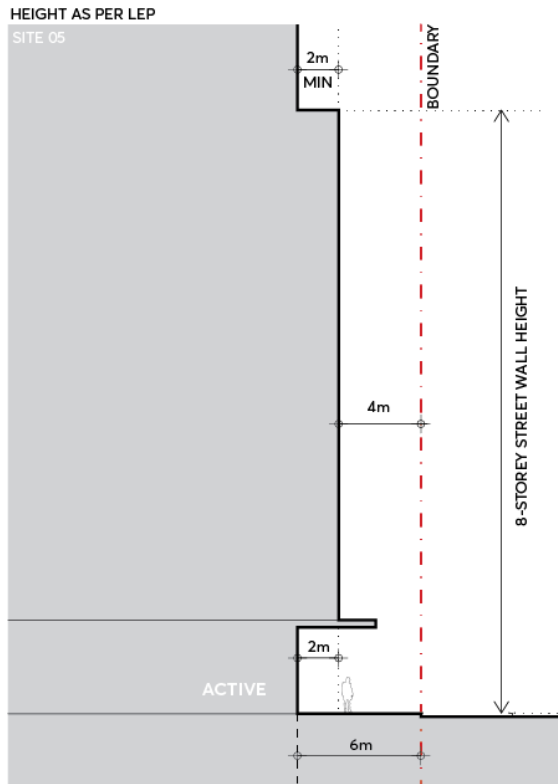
75 George Street at Smith Street (Section G) Setbacks & Street Wall Height
